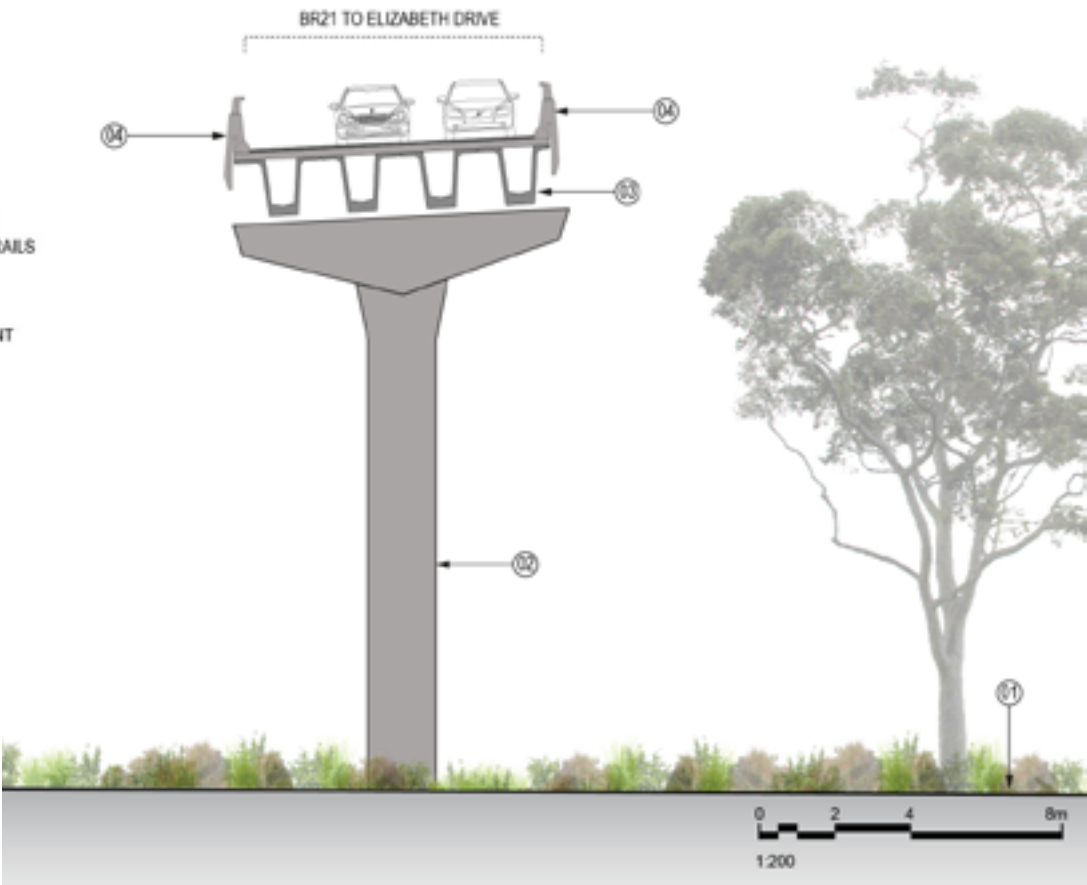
Section - M12 Eastbound to Airport Access Road Southbound
